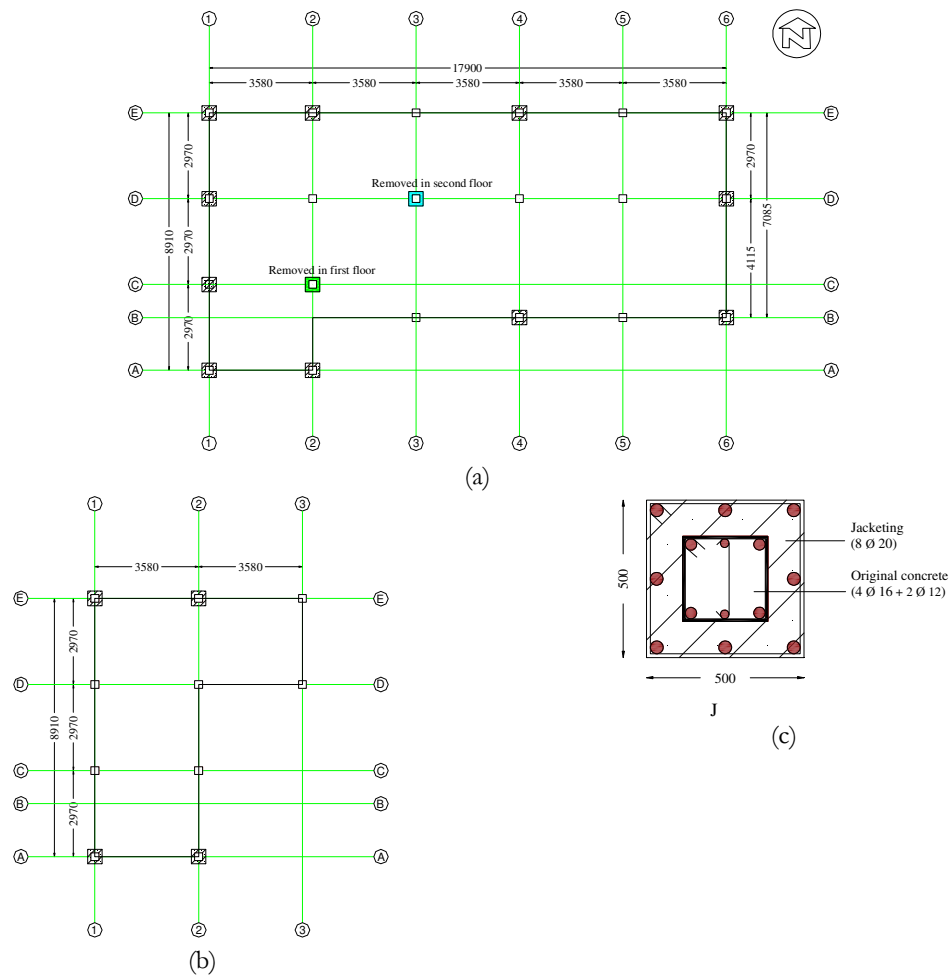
Jacketing layout in the MRT2 building; (a) Plan for basement, ground, first and second floors, (b) Top floor plan and (c) Section and reinforcement details of jacketing (all dimensions are in mm)
